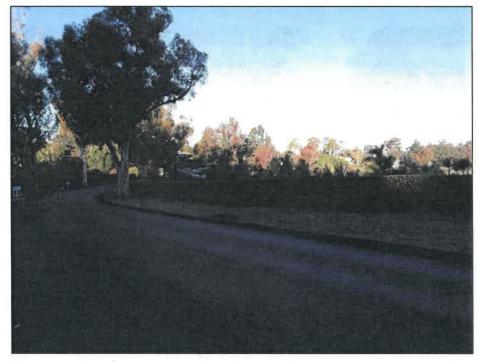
View of proposed staging area within unvegetated curb strip adjacent to Crest Road.
